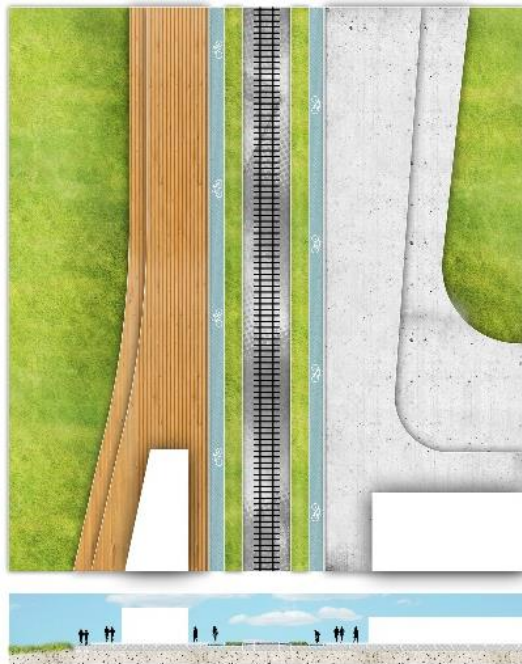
Location 2: attractive and fun walk along the railroad.
